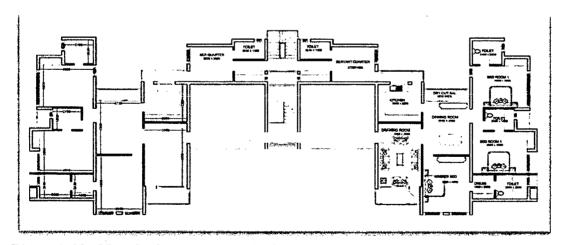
Married accommodation project (map) first floor plan Source: Engineer in chief, New Delhi
